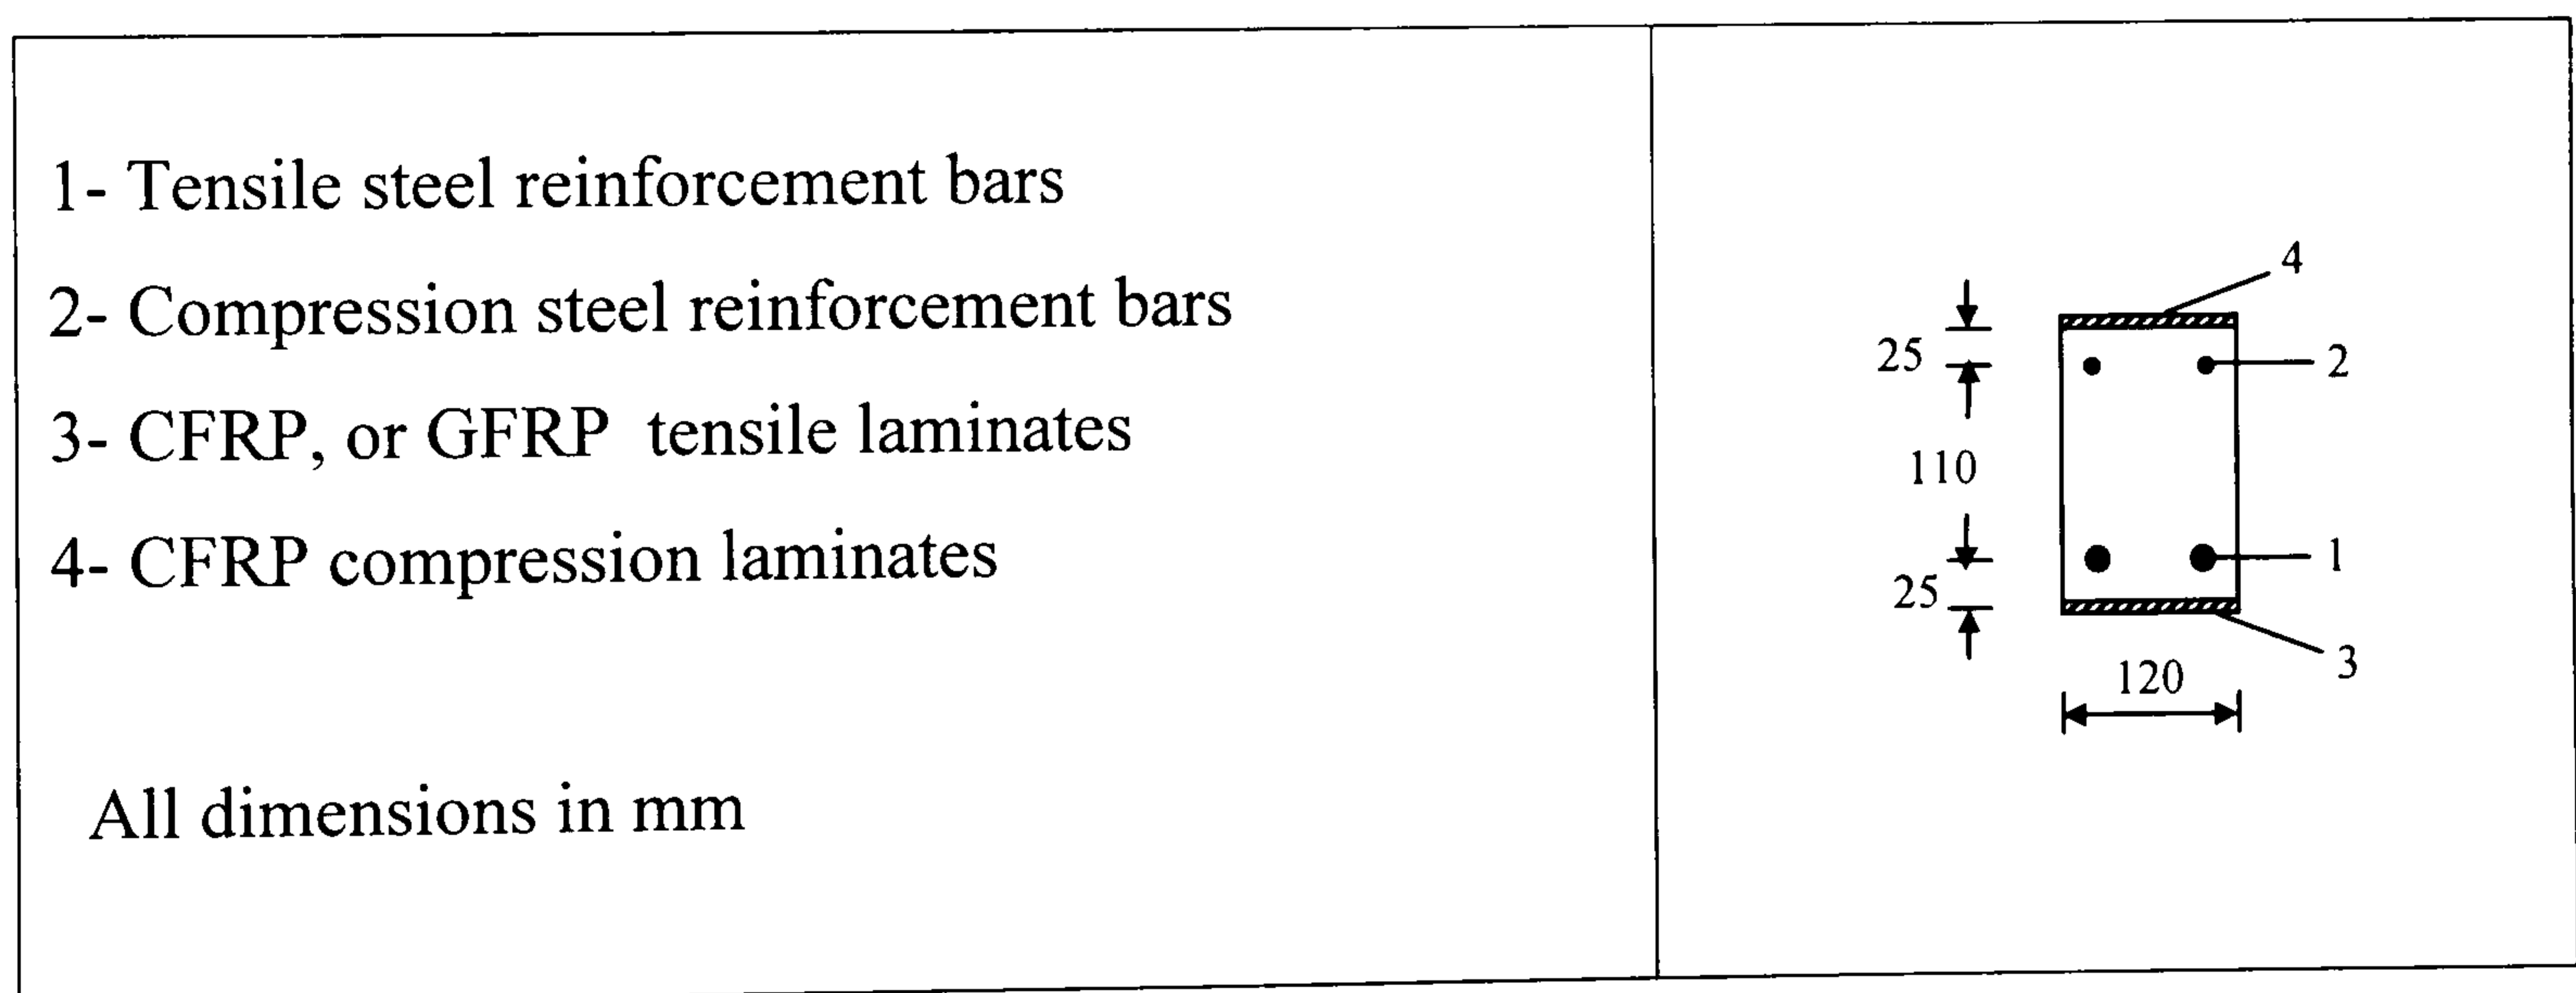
Details of reinforced concrete beam section used in the parametric analysis
